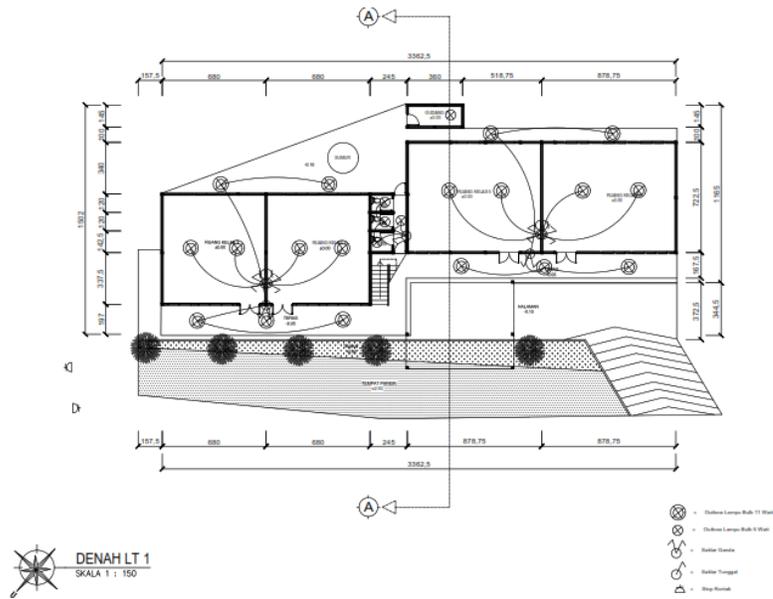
Light and socket installation design on the 1<sup>st</sup> floor
